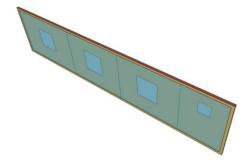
Isometric view of the Trombe wall in the analyzed building.
